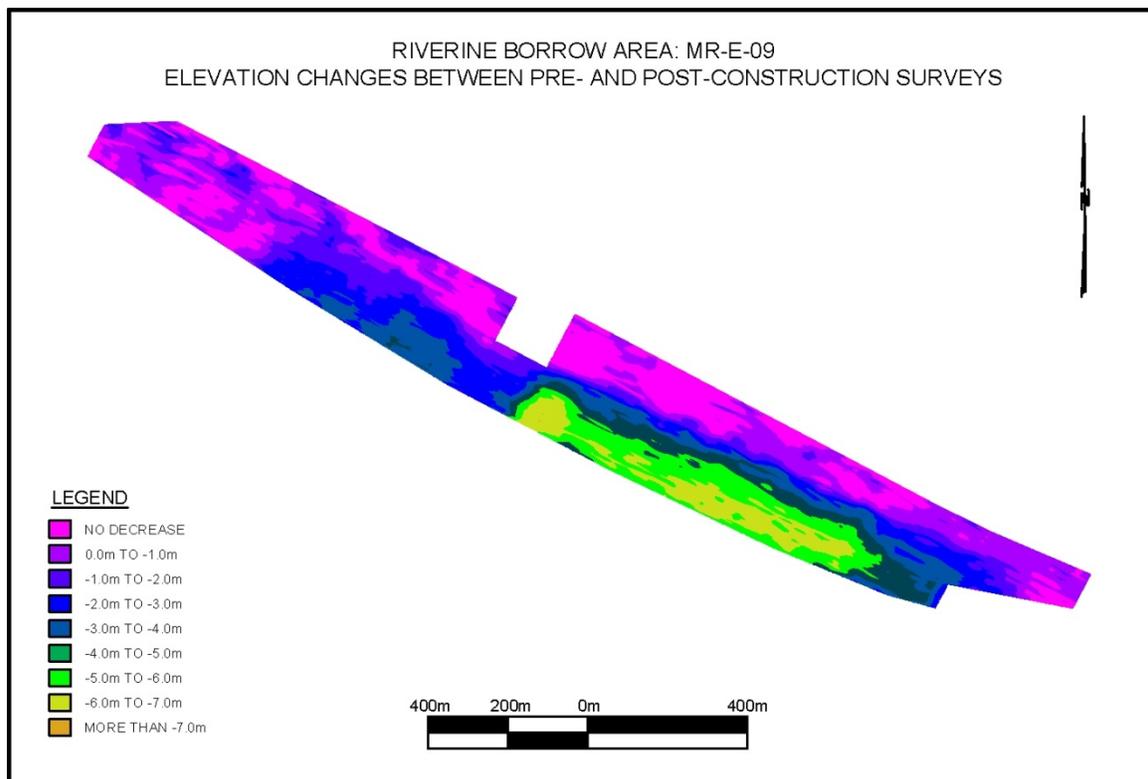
Elevation Changes Between Pre- and Post-Construction Surveys
